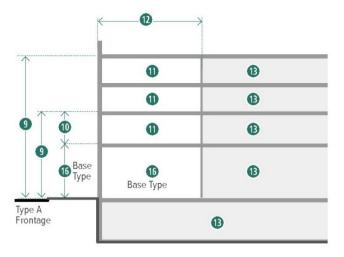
Main Street Storefront Building Section: Height & Use Requirements
